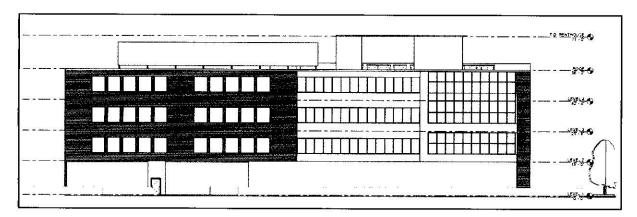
Filmore St and Fair Oaks Ave Elevation (Preliminary Only)
